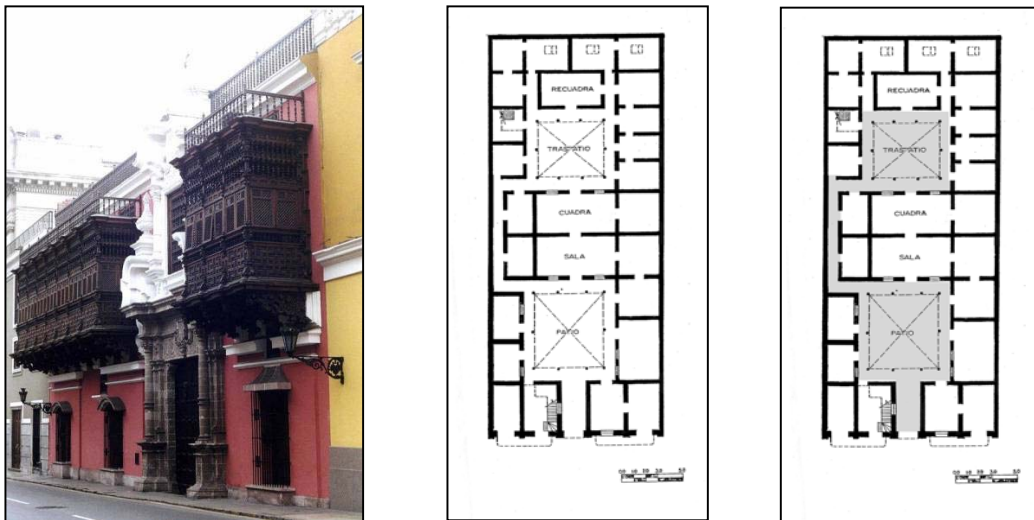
Façade and floor plans of a typical courtyard house in Lima.
